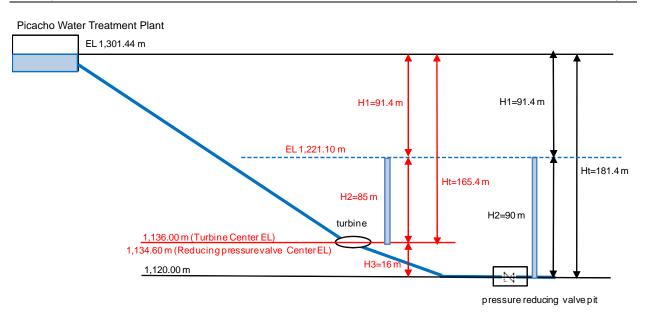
Longitudinal Profile of Picacho Hydroelectric Power Plant
